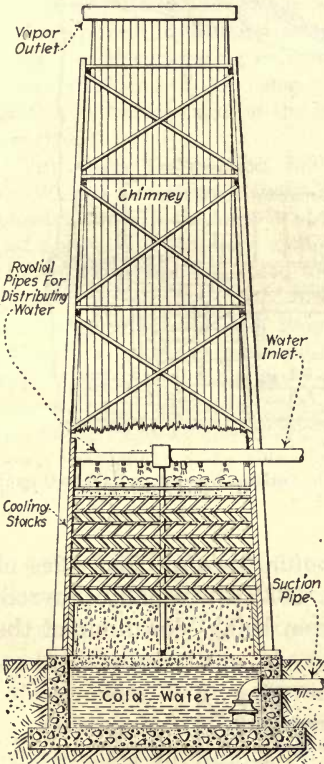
Section Of Typical Wheeler-Balcke Natural Draft Cooling-Tower.
